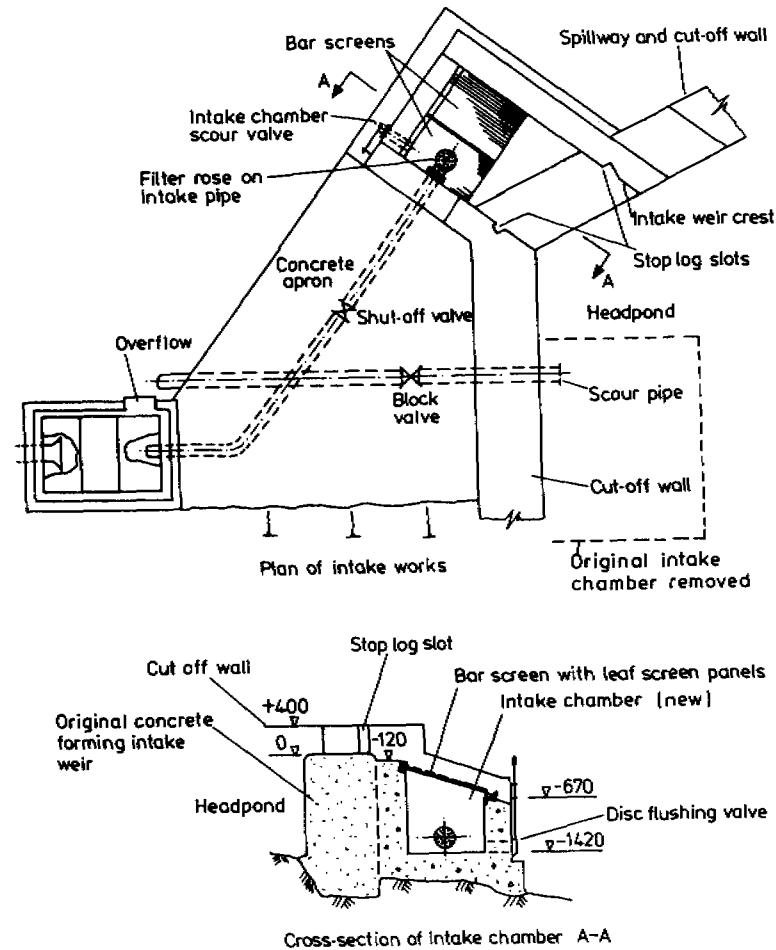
Glenfinnan power schemes - Stalker's intake improvements
